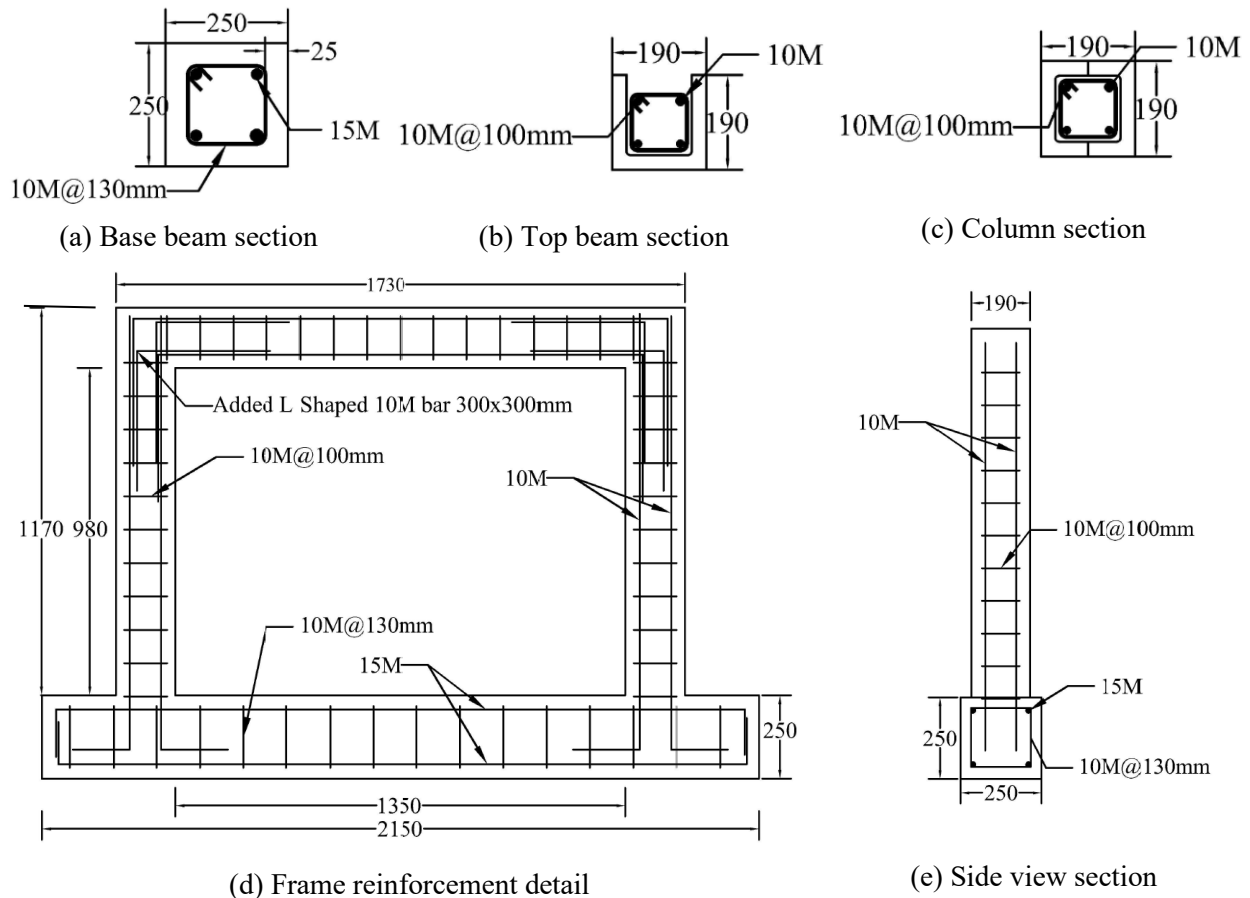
Boundary frame section reinforcement details (unit: mm)
